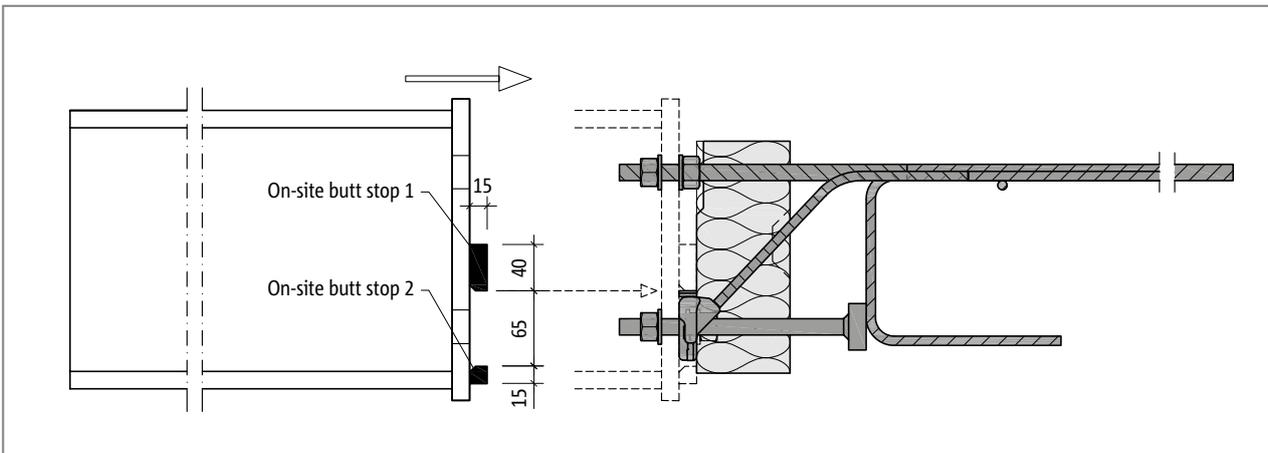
Schöck Isokorb® T type SK: Mounting the steel member
